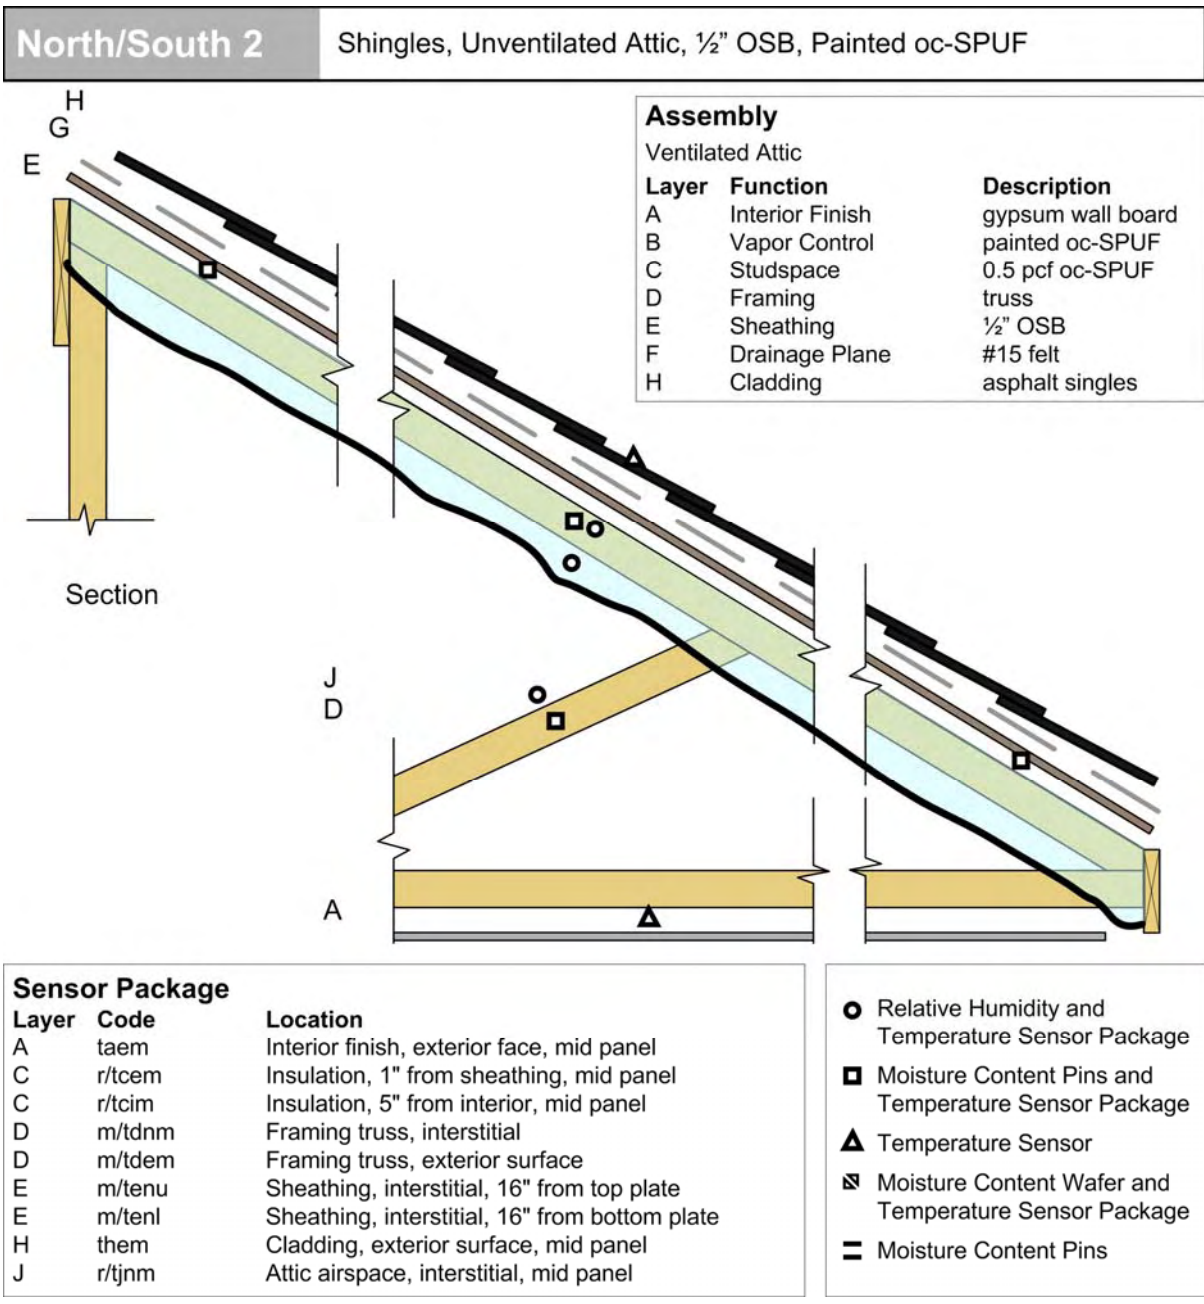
Test Roof 2: UCA with painted foam, construction and sensor layout
